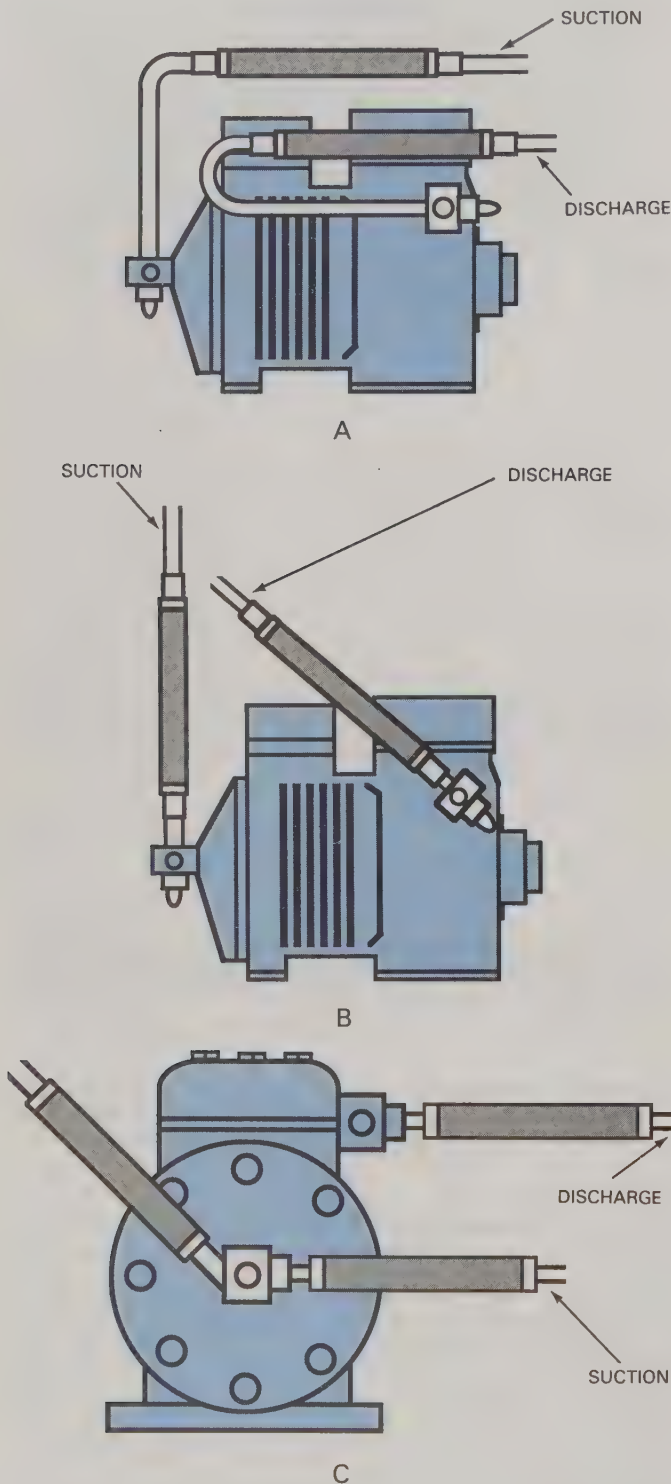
Methods of installing vibration eliminators. A—Recommended installation, with vibration eliminators parallel with the compressor crankshaft. B—An acceptable installation. C—An incorrect installation, with vibration eliminators at right angle to the crankshaft.
